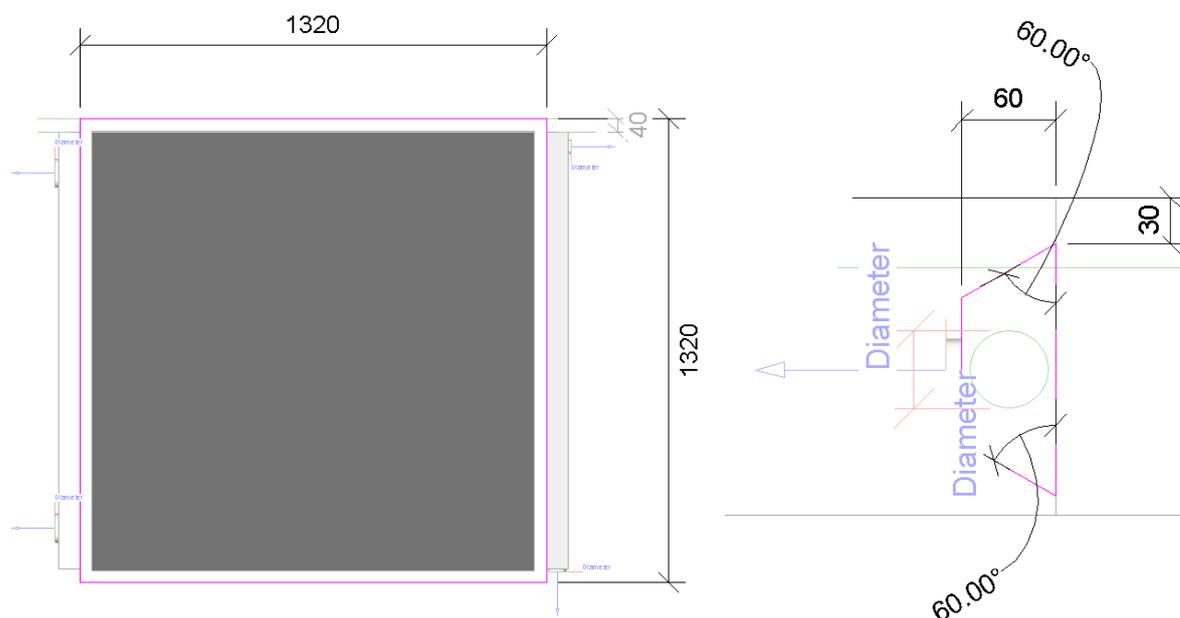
Main extrusion of the cooler and side parallelogram extrusions.
